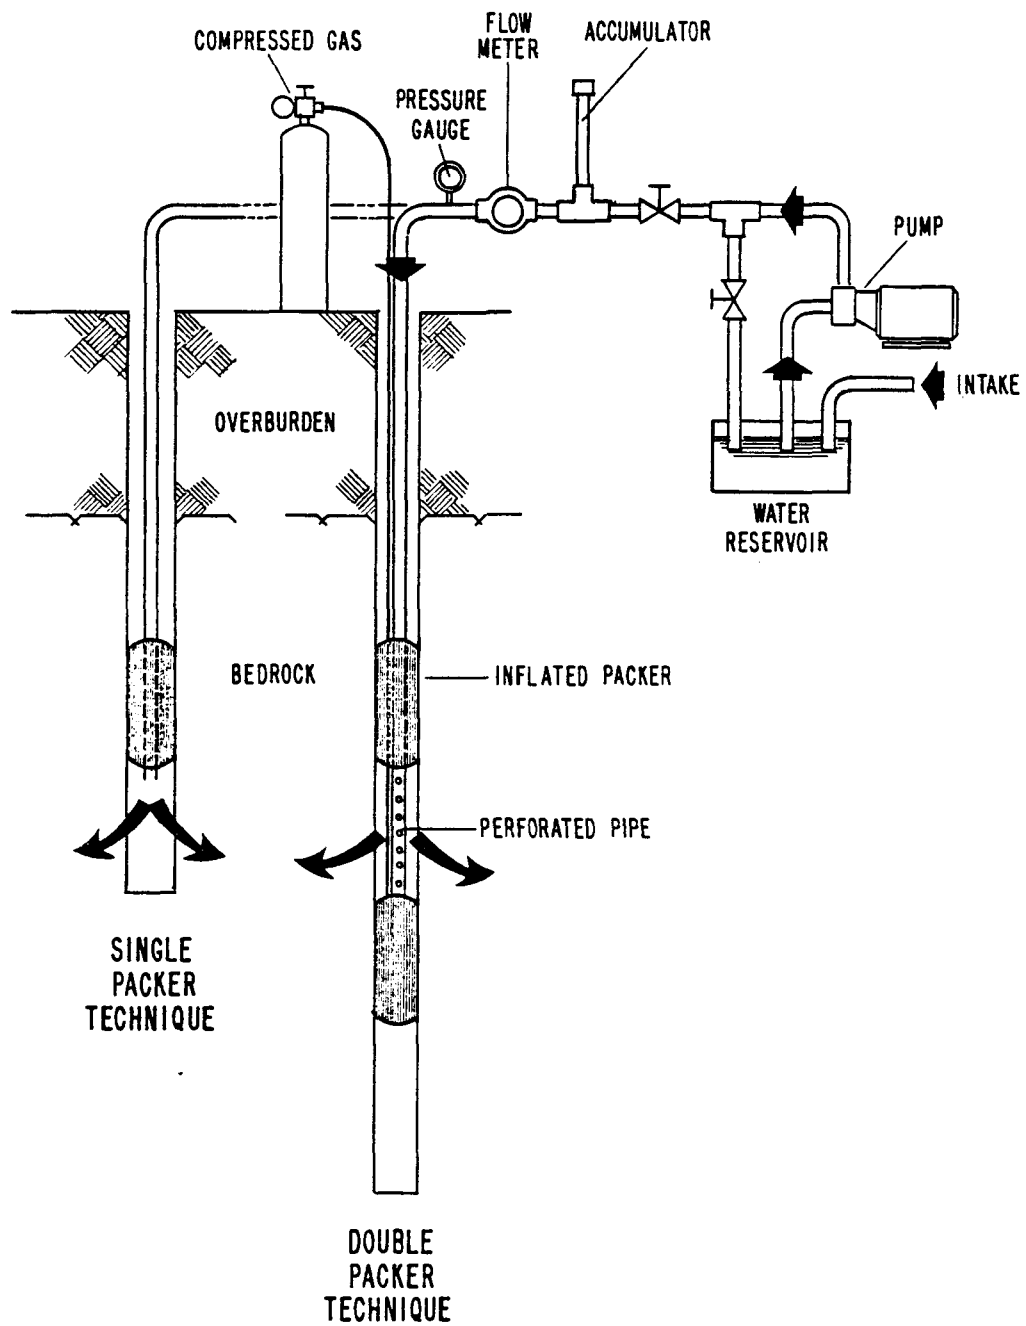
TYPICAL PERMEABILITY TEST SETUP
